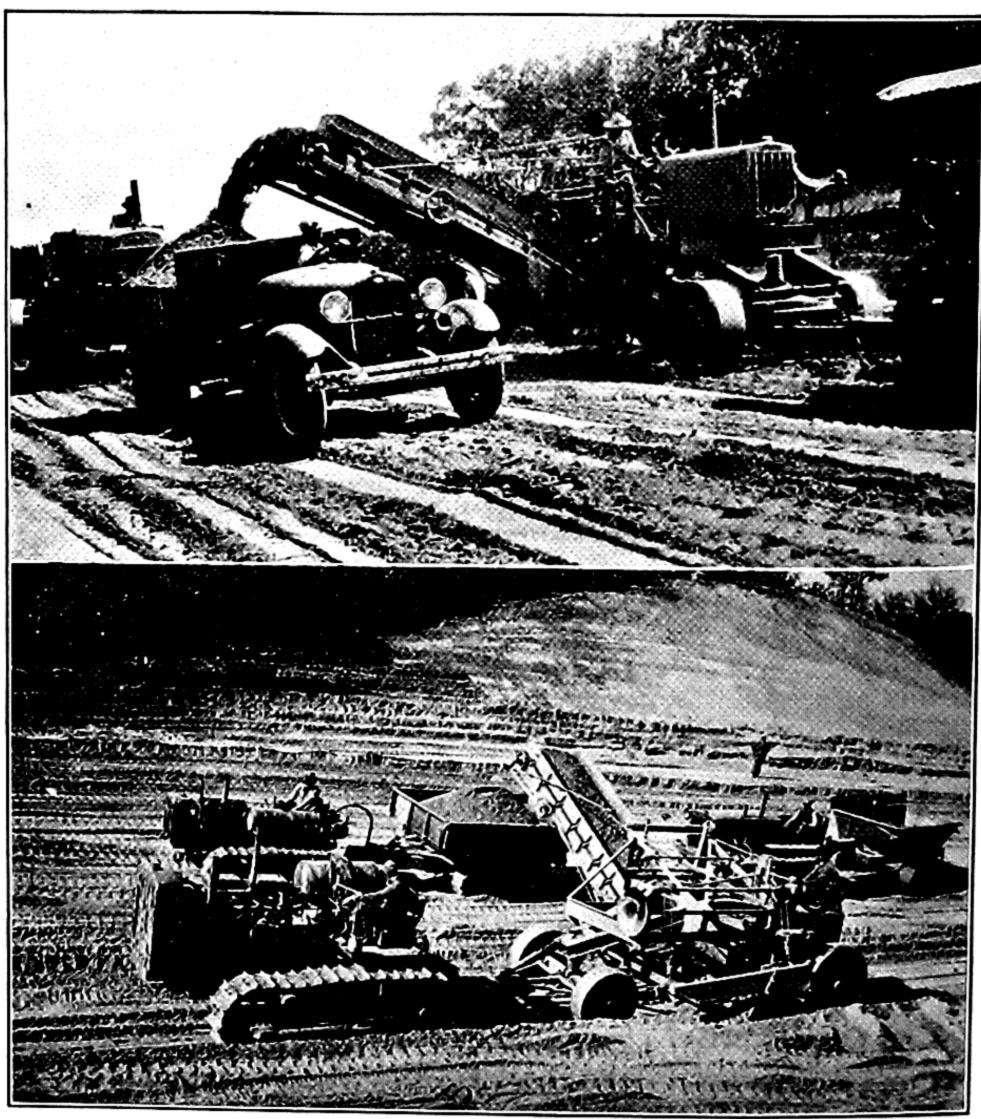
The elevating grader on grade reduction work. (Courtesy of U.S. Public Roads.)
